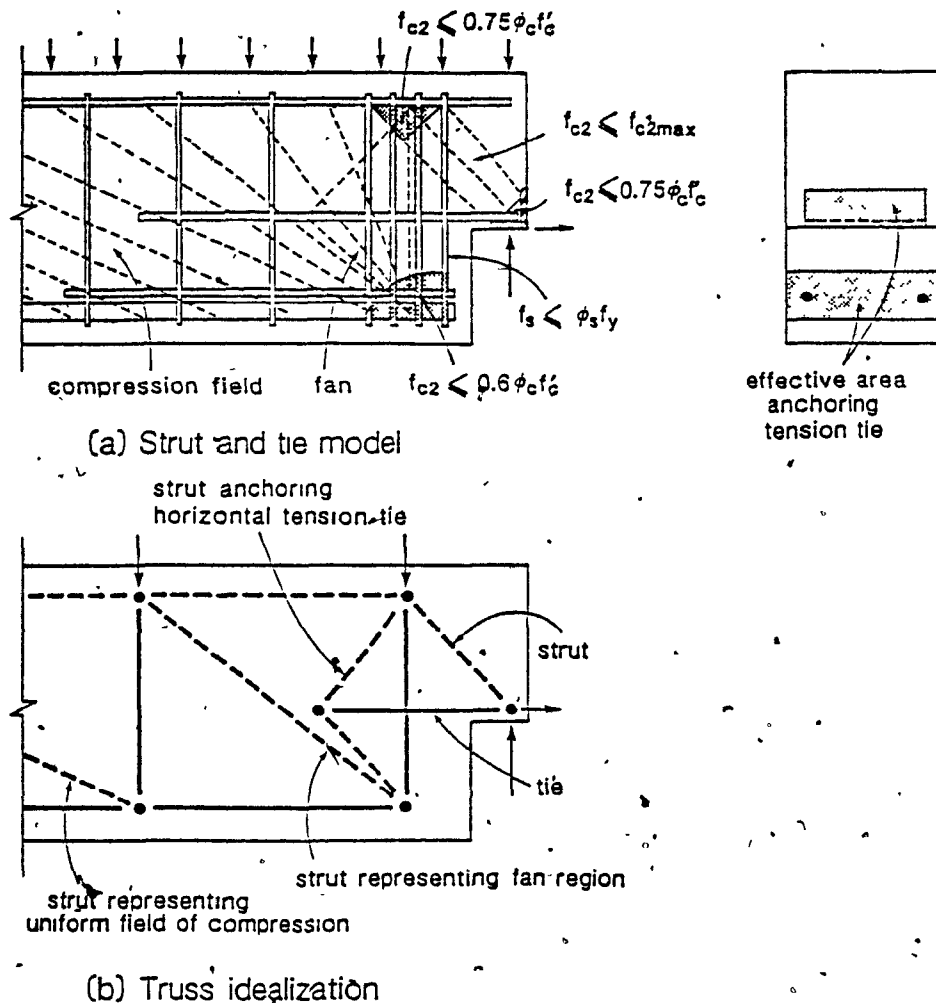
Strut and Tie Modelling of a Dapped End Beam.
